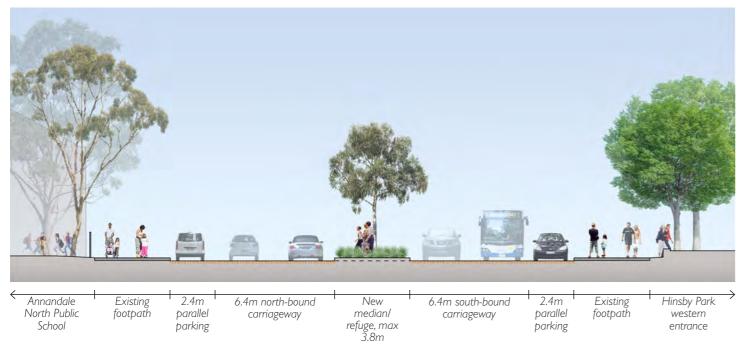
INDICATIVE SECTION THROUGH JOHNSTON STREET AT HINSBY PARK, 1:200 @A3
